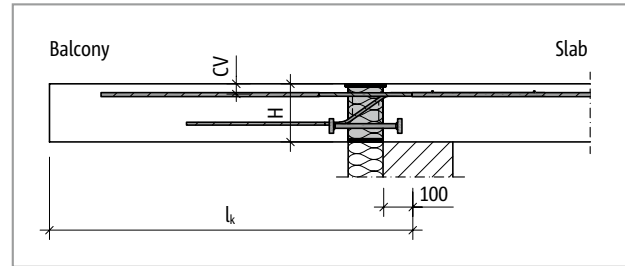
Schöck Isokorb® XT type K-M11: Static system
